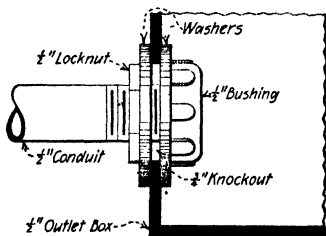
Method of fastening a $\frac{1}{2}$ -in. conduit in a $\frac{3}{4}$ -in. knockout hole.
